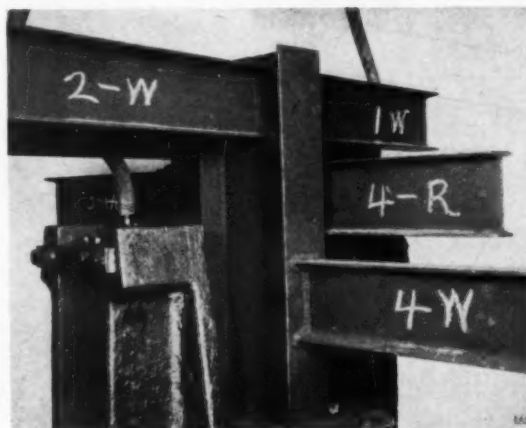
VIBRATION TEST PIECE SHOWING ARC WELDED CONNECTIONS
